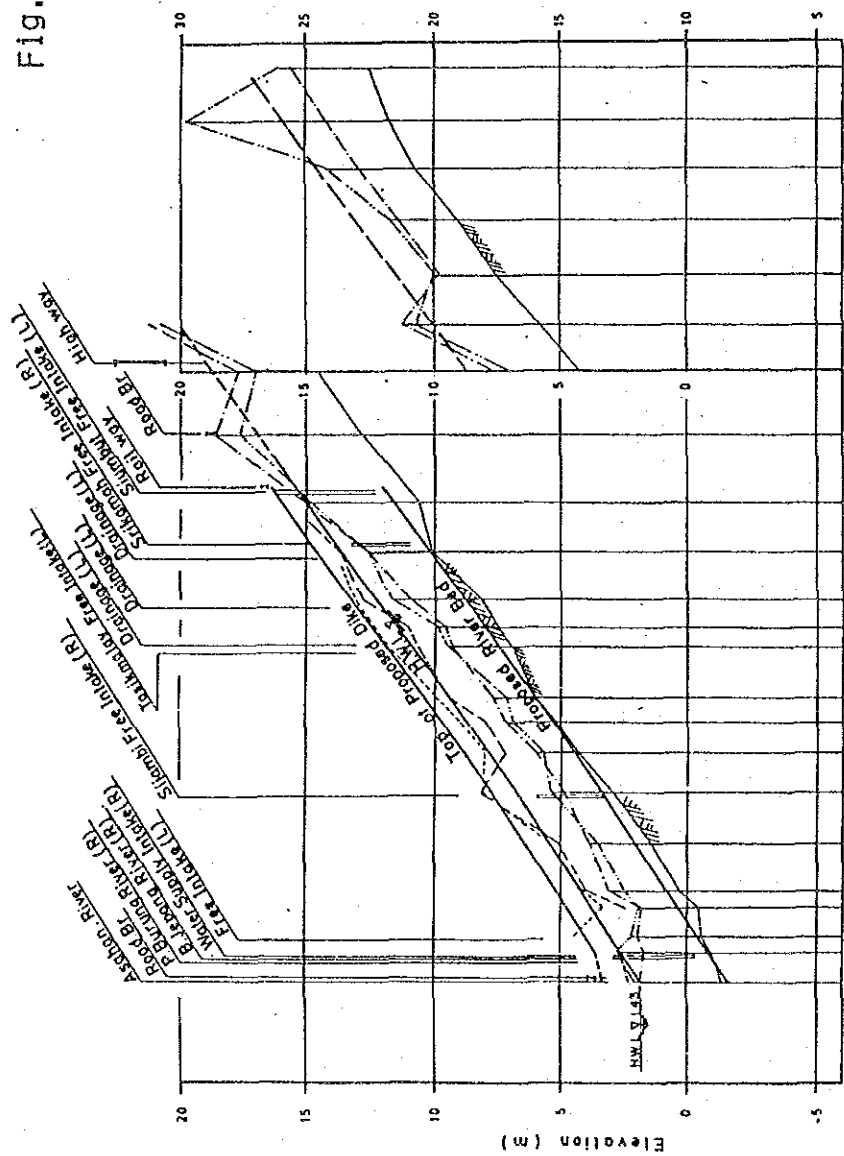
Proposed Urgent Plan of Asahan and Silau Rivers (4/6)
